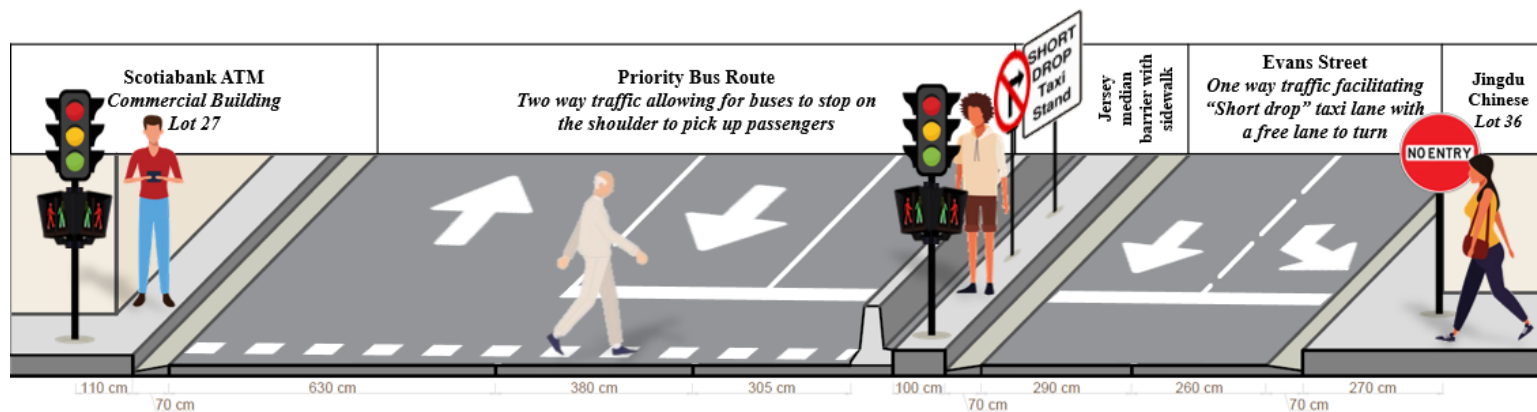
Pictorial view section C-D: PBR and Evans Street
